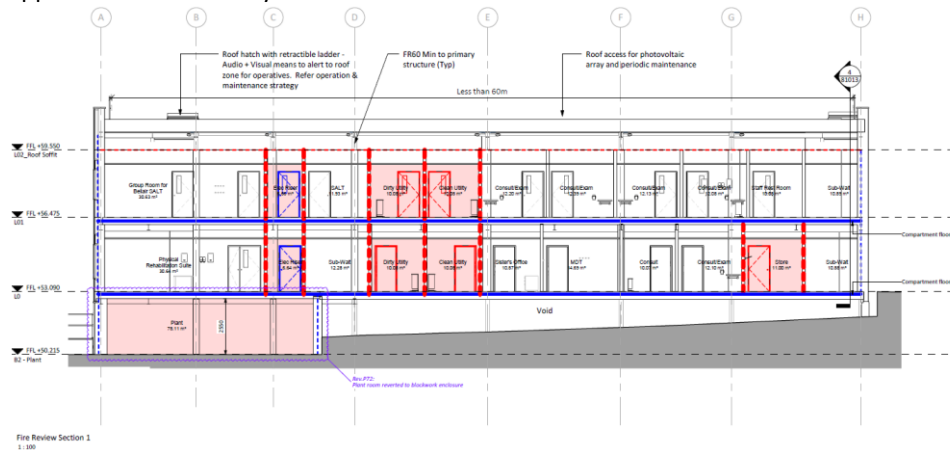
Cross Section – Plant under croft illustrated with Blue Fill
